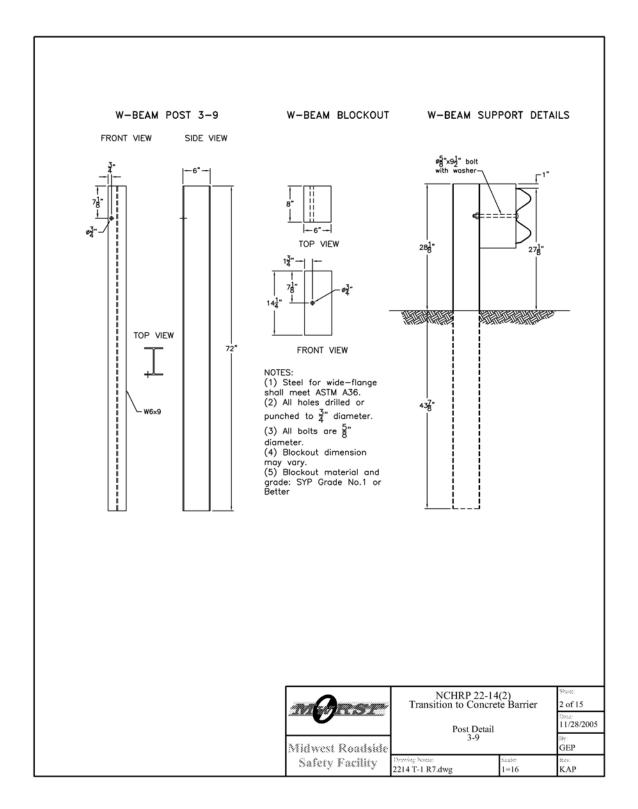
Approach Guardrail Transition to Concrete Barrier Design - Post Details (English)
